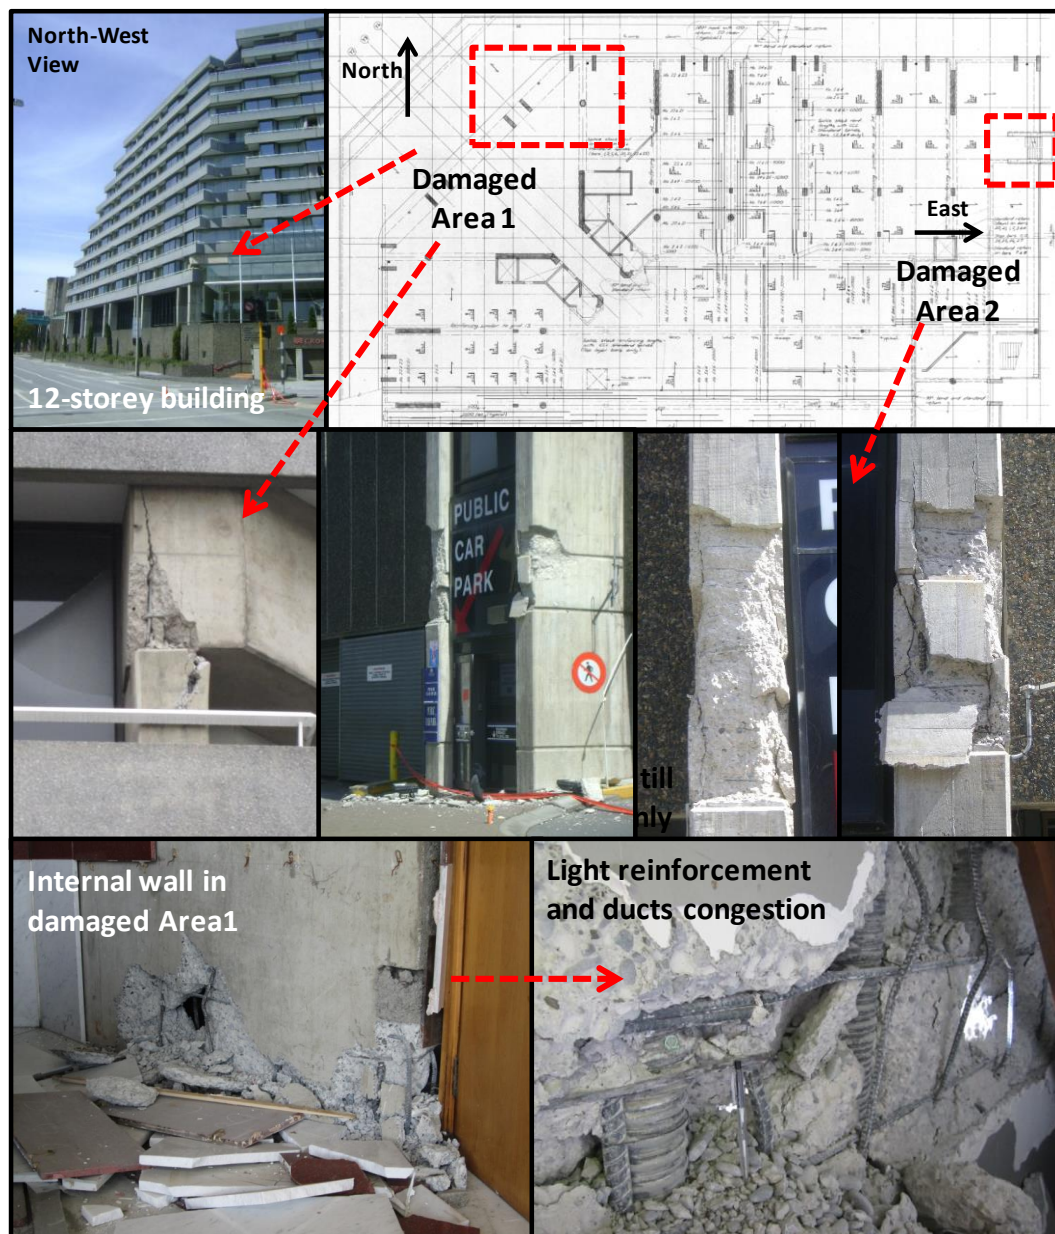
Building G (12-storeys) layout and damaged areas. Walls with close spaced boundary elements and internal wall lightly reinforced with ducts congestion.
